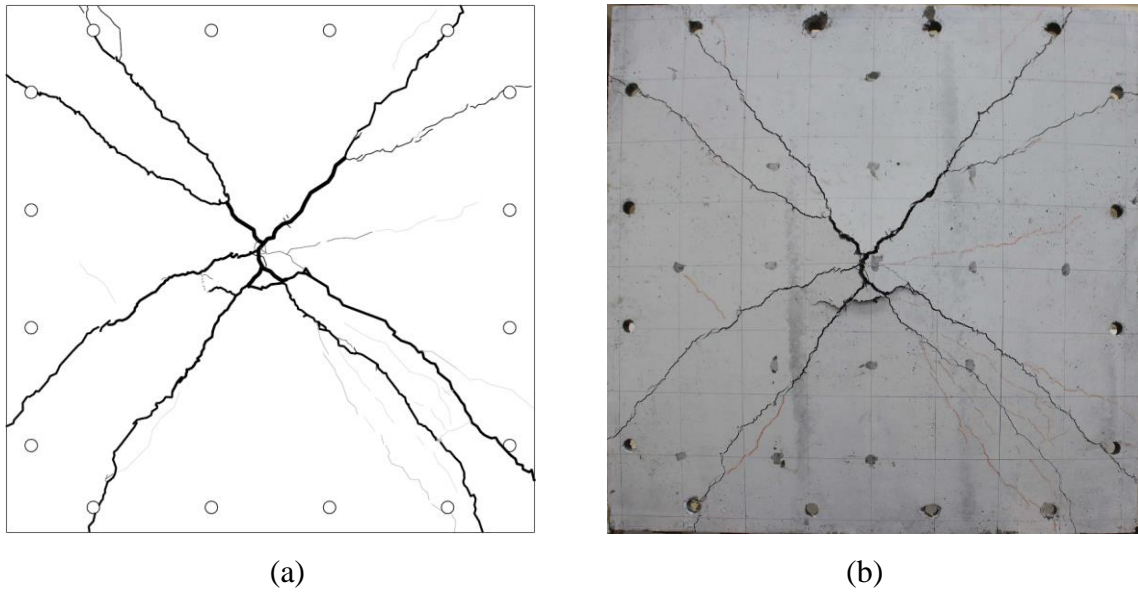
Bottom surface crack patterns after testing for panel JN1-075 +PVA
